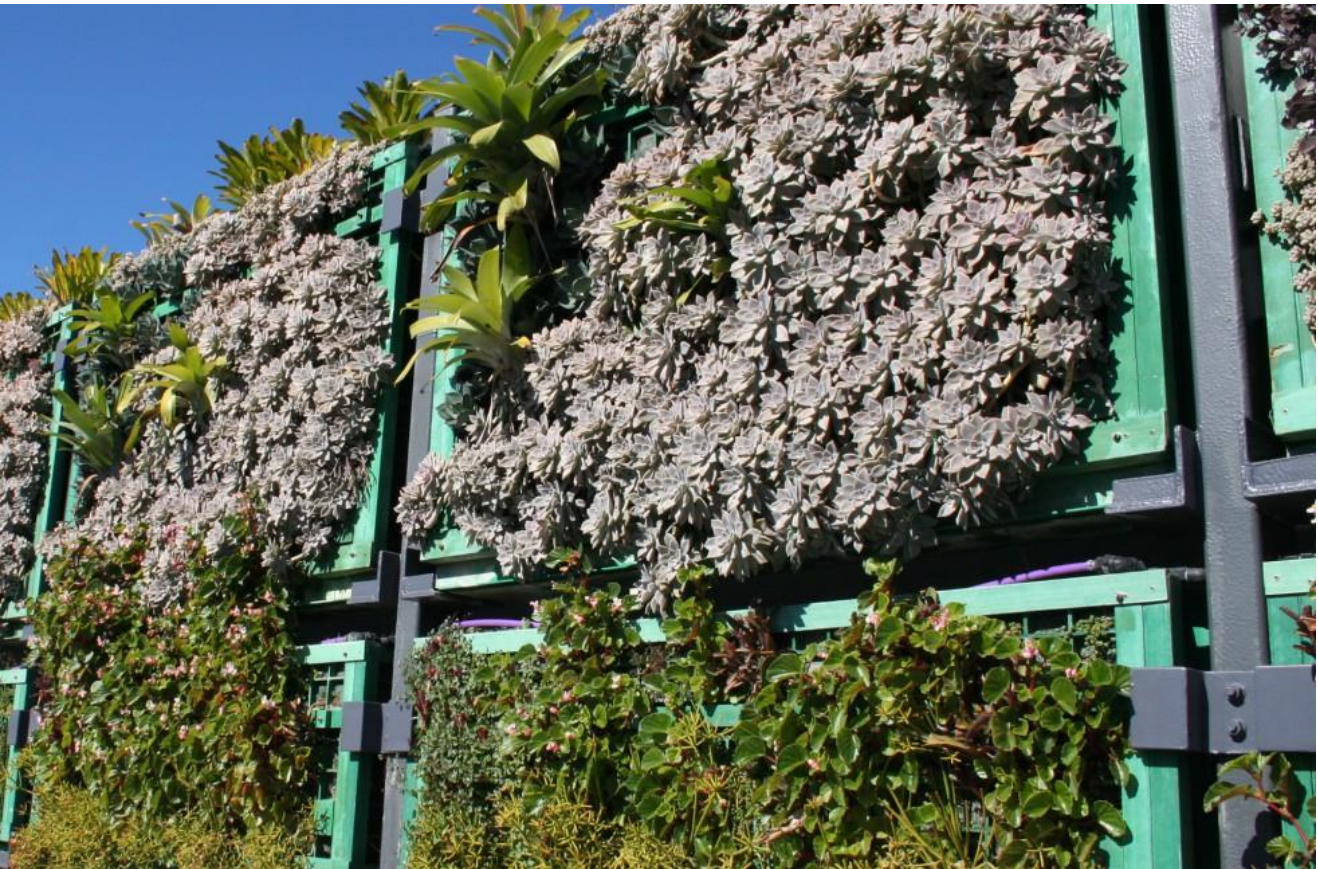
Photo of a small part of Airport Link Green Wall showing variety of planting and supporting structure
